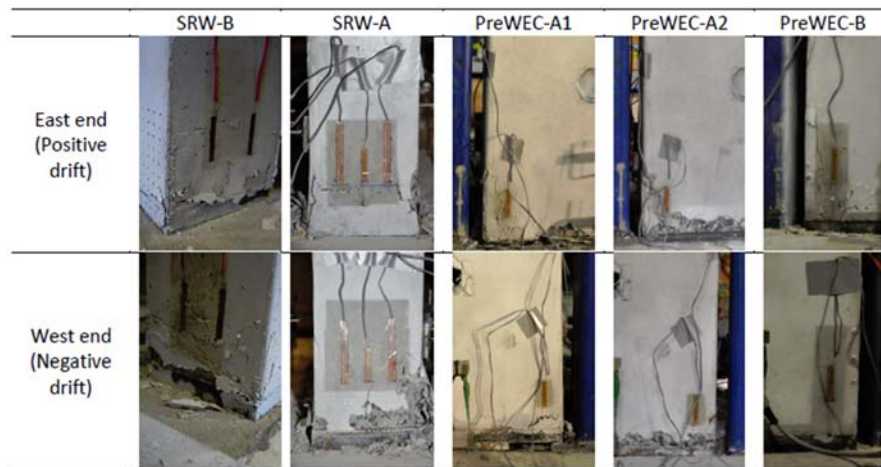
Damage to the wall toes during quasi-static testing of SRWs and PreWECs (Twigden 2016)
